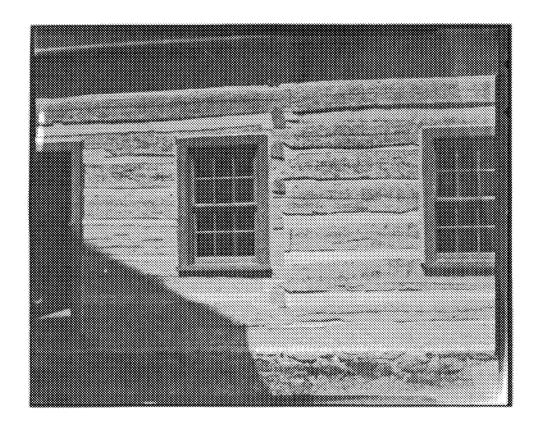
Hampton Quarter 1, detail of southwest elevation looking northeast.
